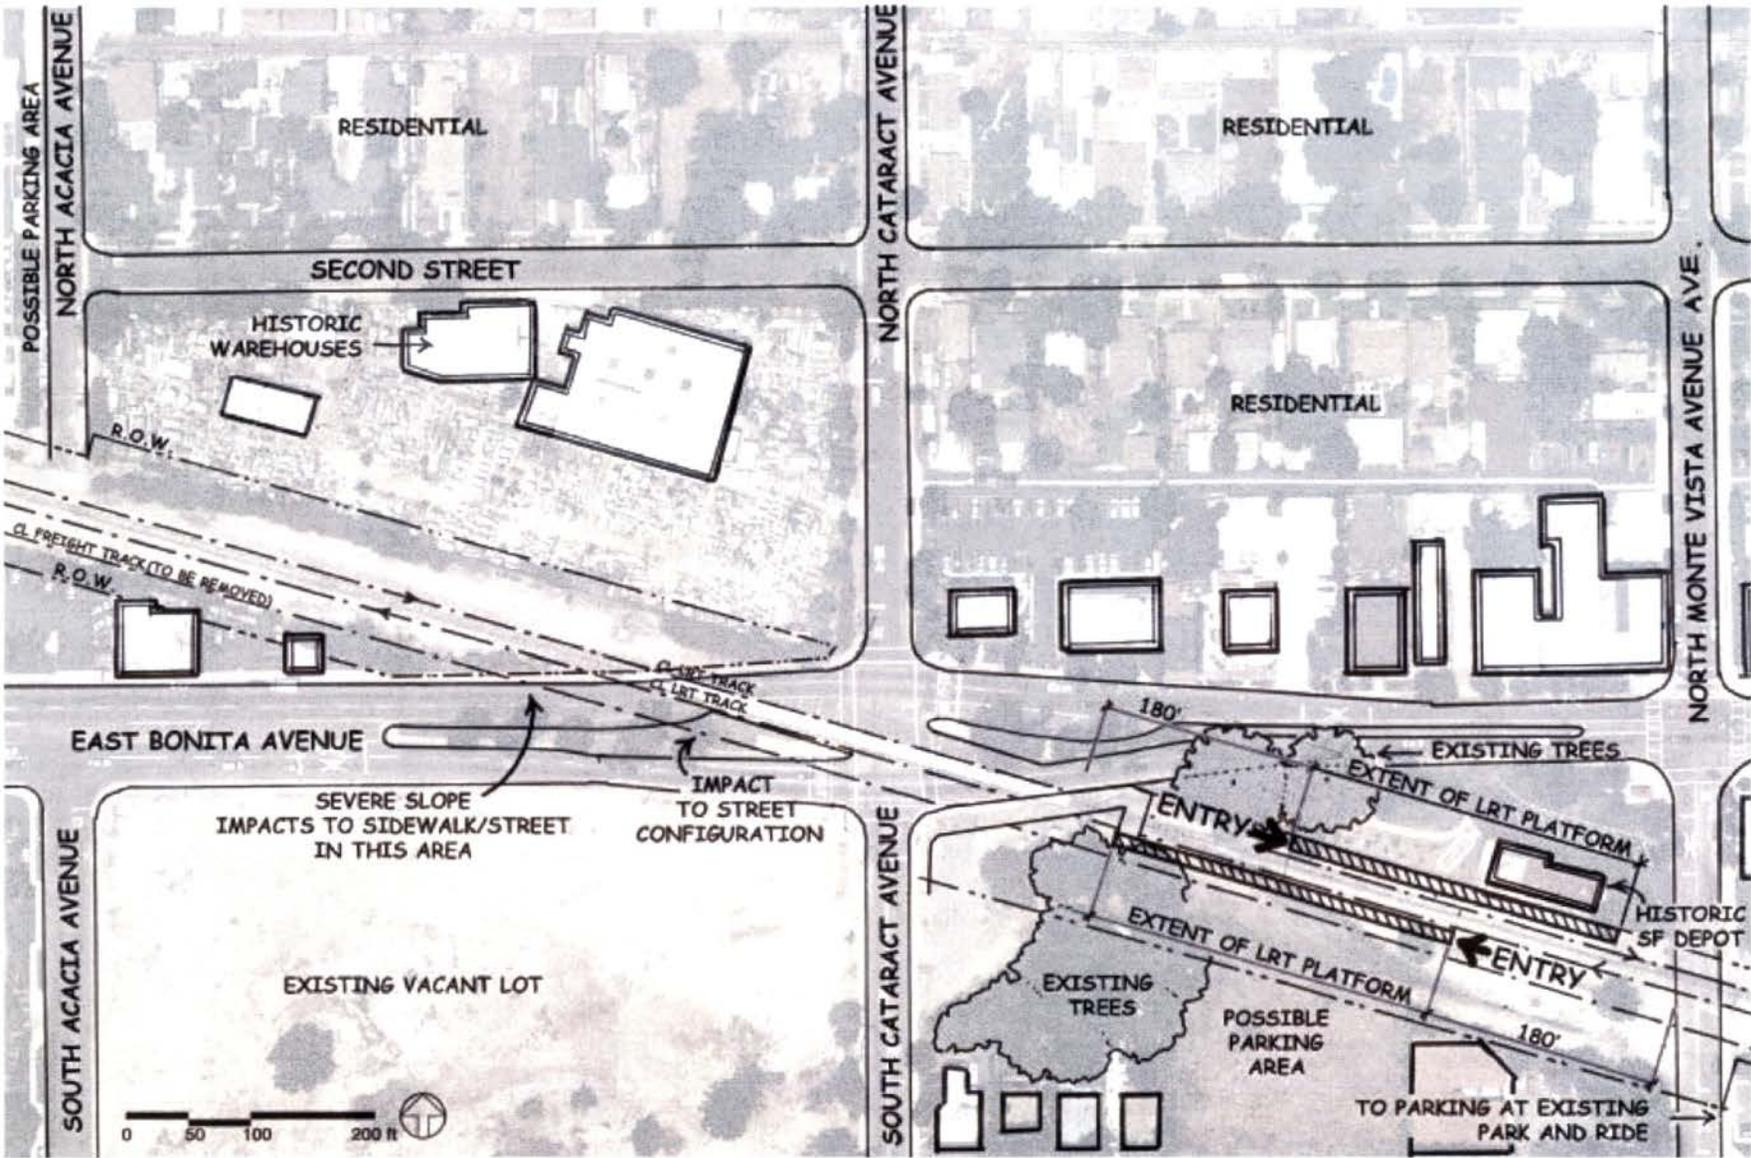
Site Plan: City of San Dimas Station, 2-Track Alternative
